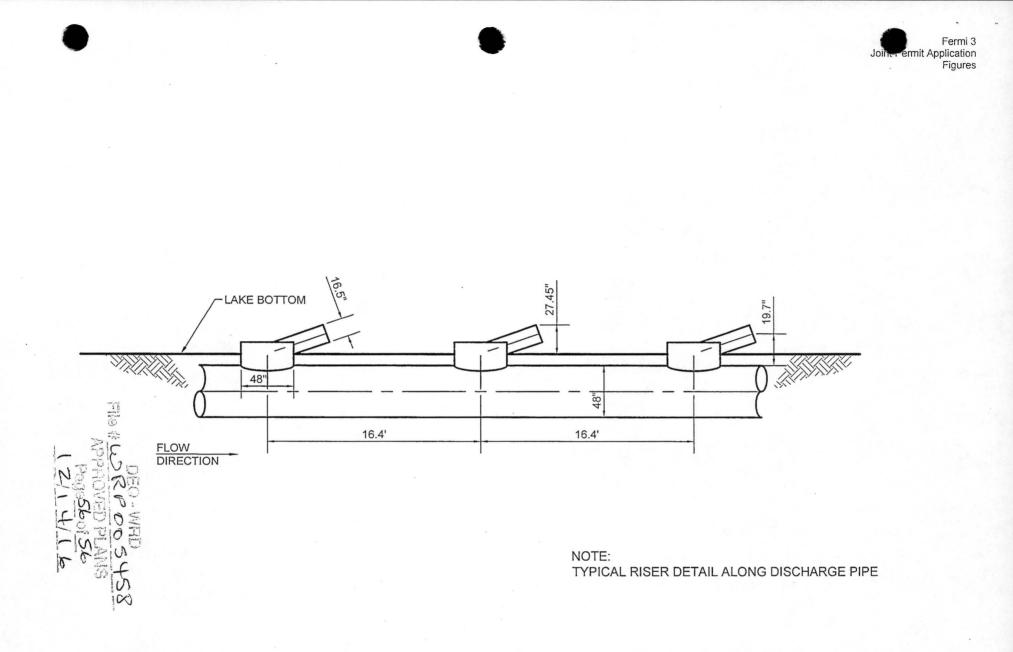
C LAKE ERIE CONSTRUCTION AREA PIPE DREDGING SECTION 'B' DETAILS
